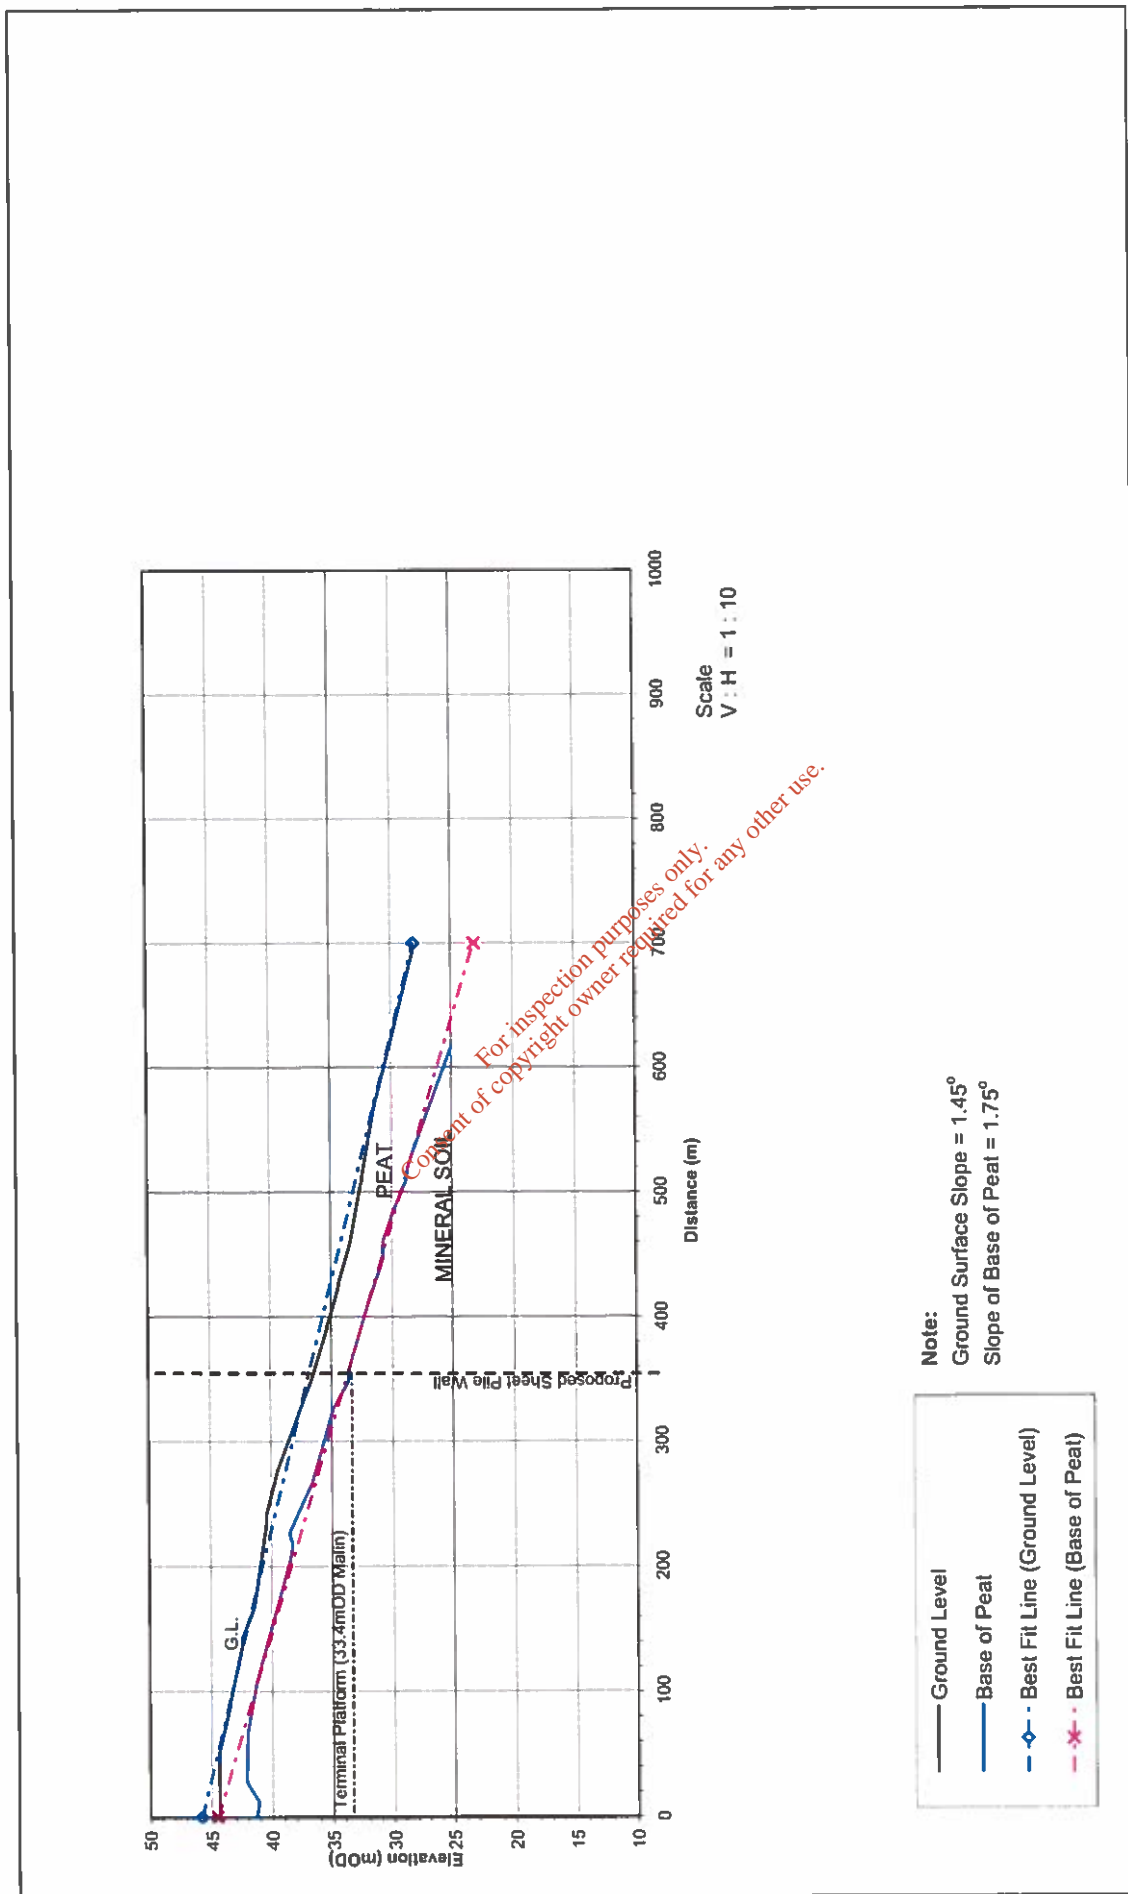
Typical Cross-section along Central Area (Cross-section 3)
